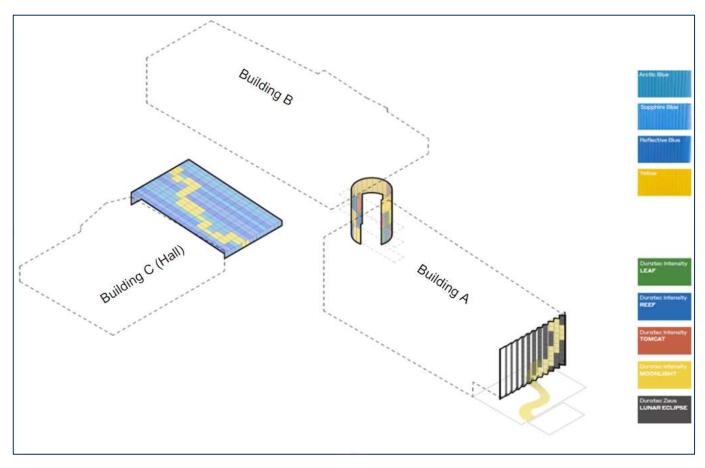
| Colour scheme of front façade, central building link and COLA (Source: Applicant's EIS 2023)
